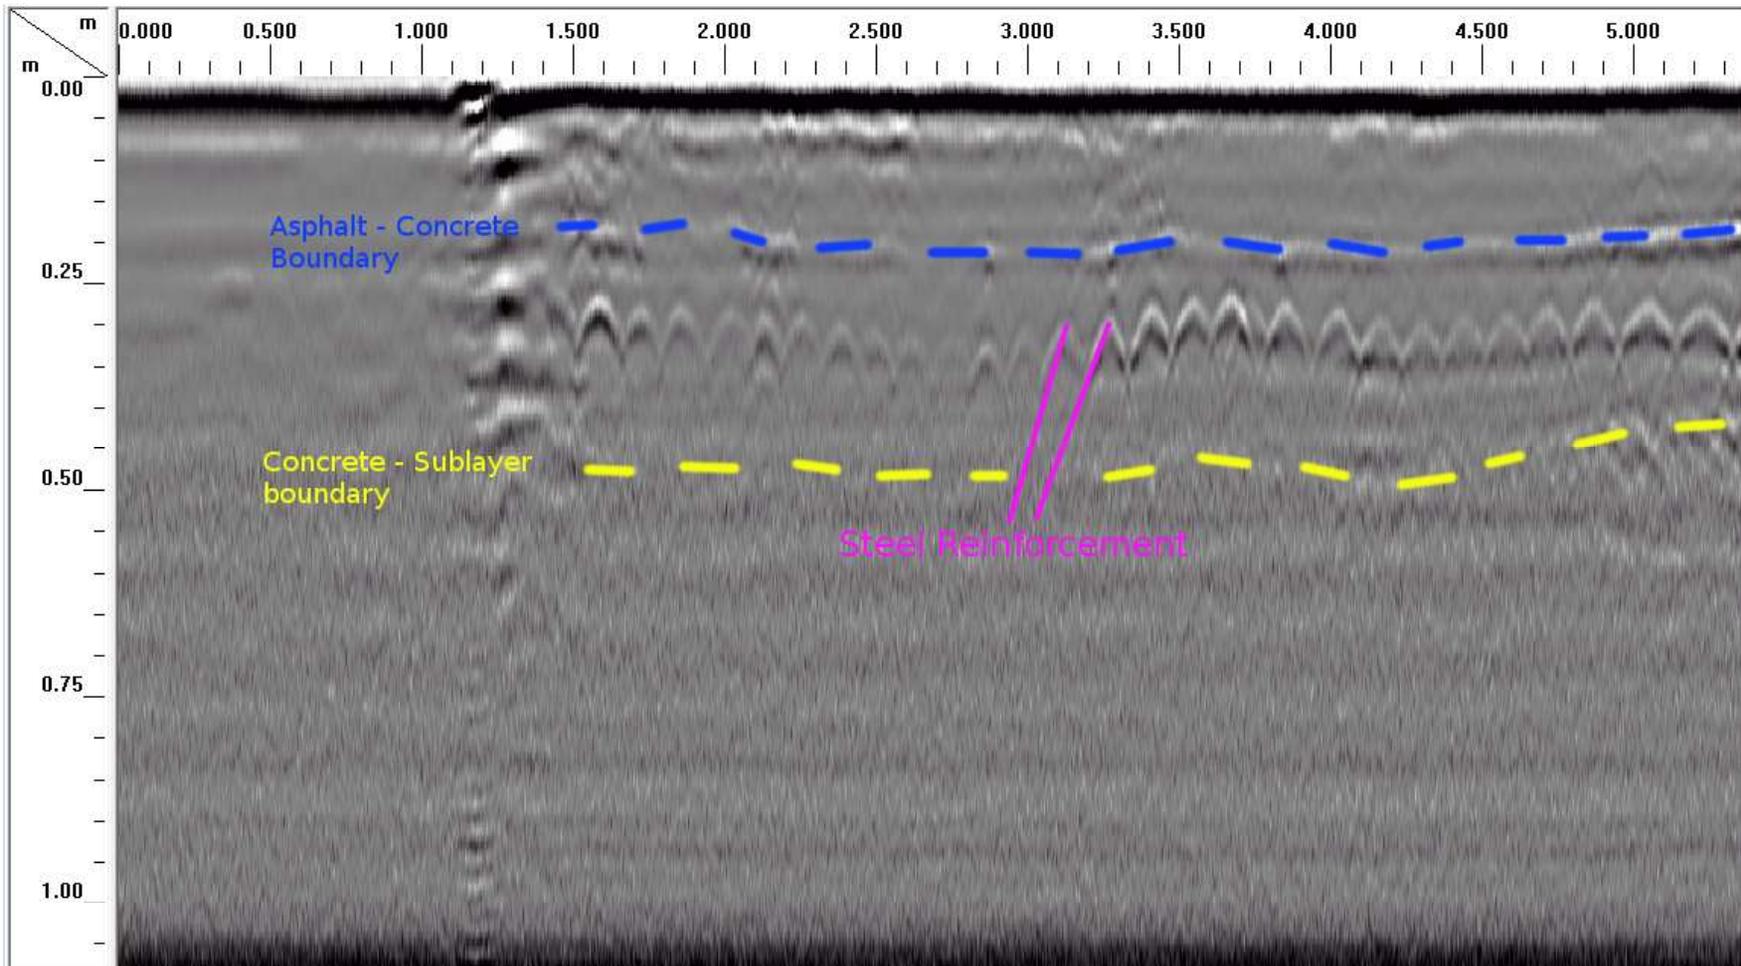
Example of steel reinforcement from the Southern segment, as well as subsurface boundaries. Evenly spaced steel reinforcement; 15cm spacing.
